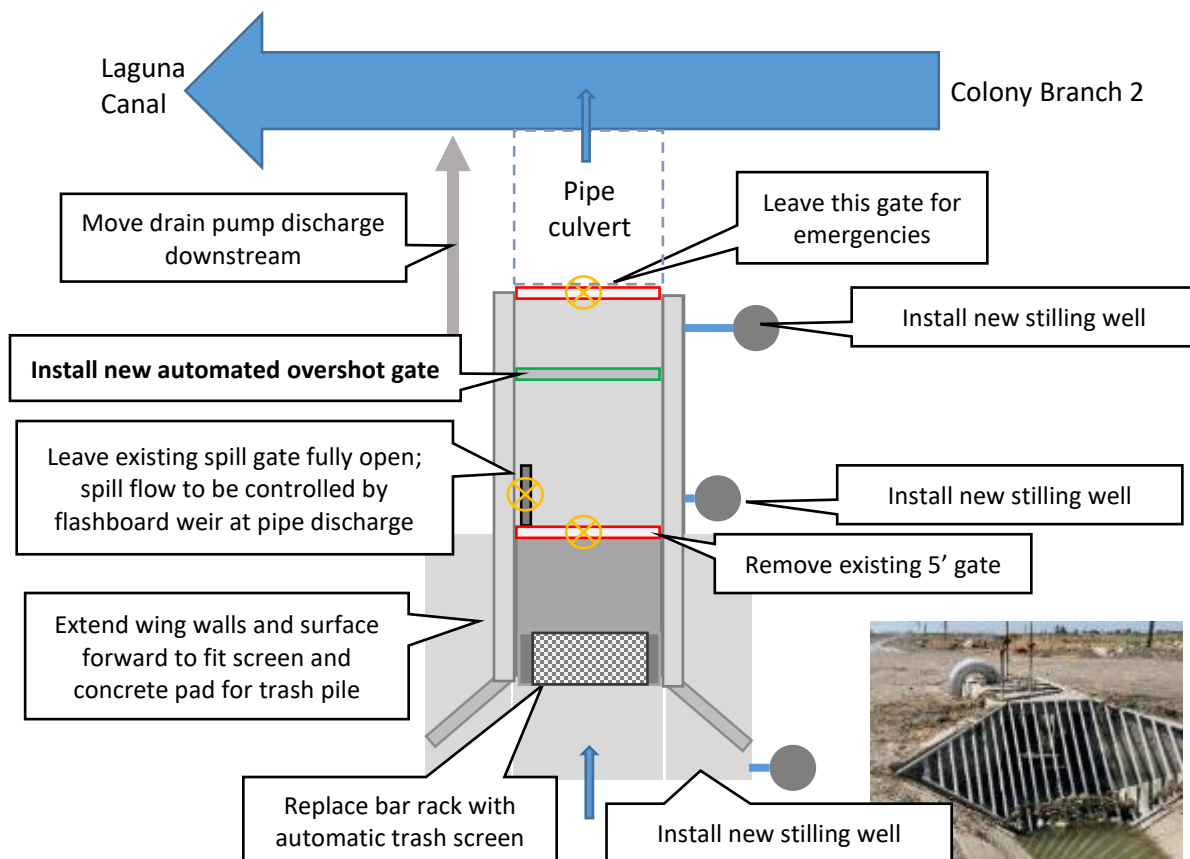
Photo (right) and plan view conceptual drawing showing modifications to the Laguna Canal gate structure just upstream of the convergence with Branch 2 Canal
